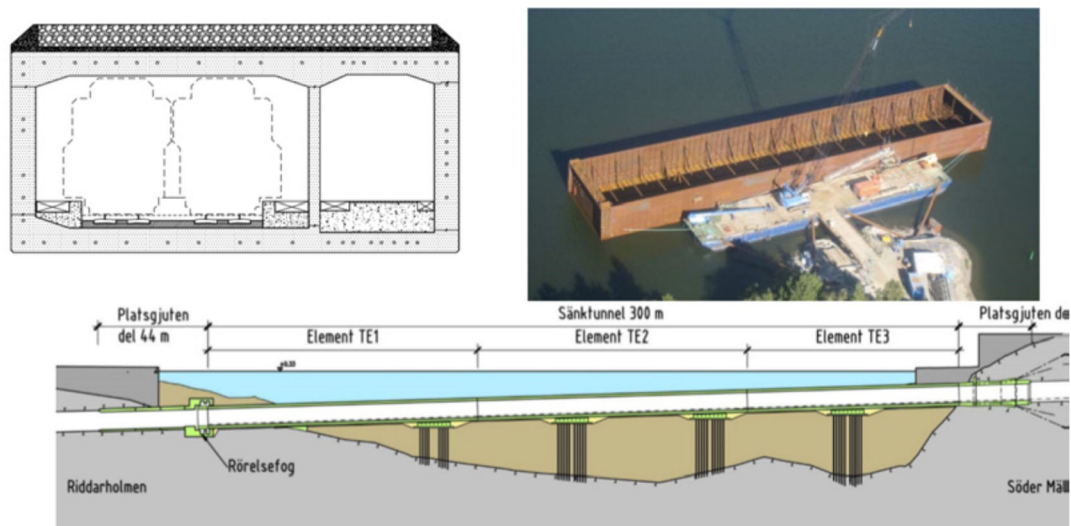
Söderströmstunnel - cross-section, concrete casting afloat and longitudinal section, Trafikkverket
